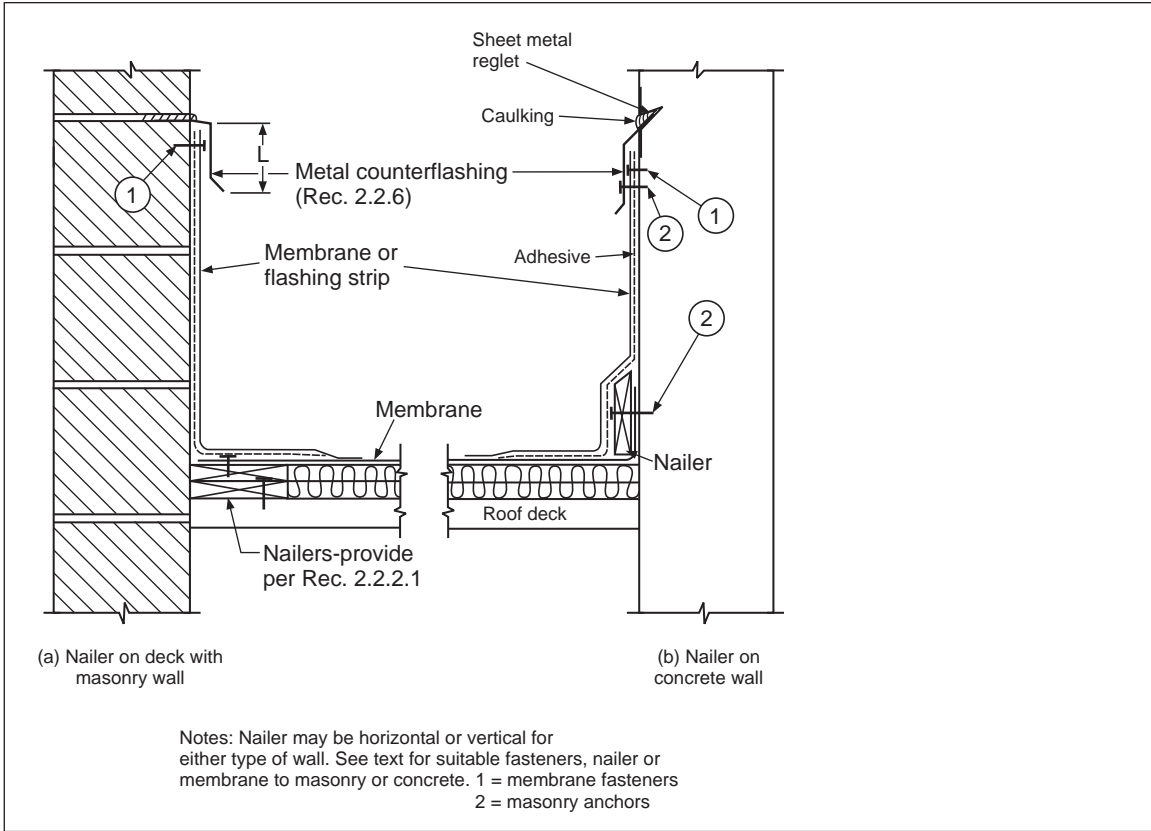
Single-ply membrane wall or parapet terminations with reglets
